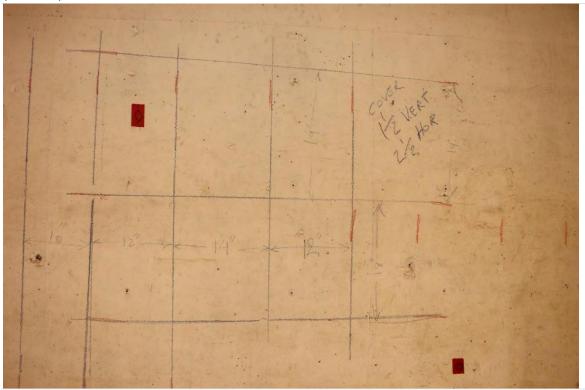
Concrete coring, West Wall, 1962 Construction - Basement (BA2-33)
